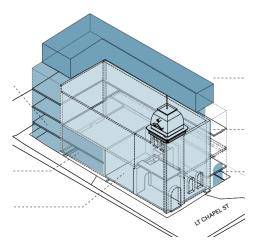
Massing presented at the preapplication meeting while the proposal was being developed. Source: Trethowan Architecture, 2024.
